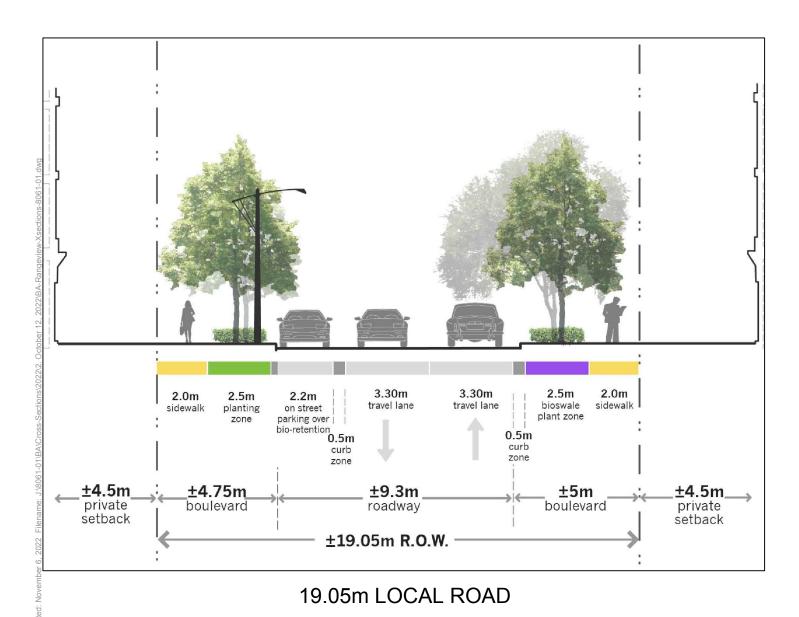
PROPOSED STREET 'G' EXTENSION - FUNCTIONAL PLAN & CROSS-SECTIONS
